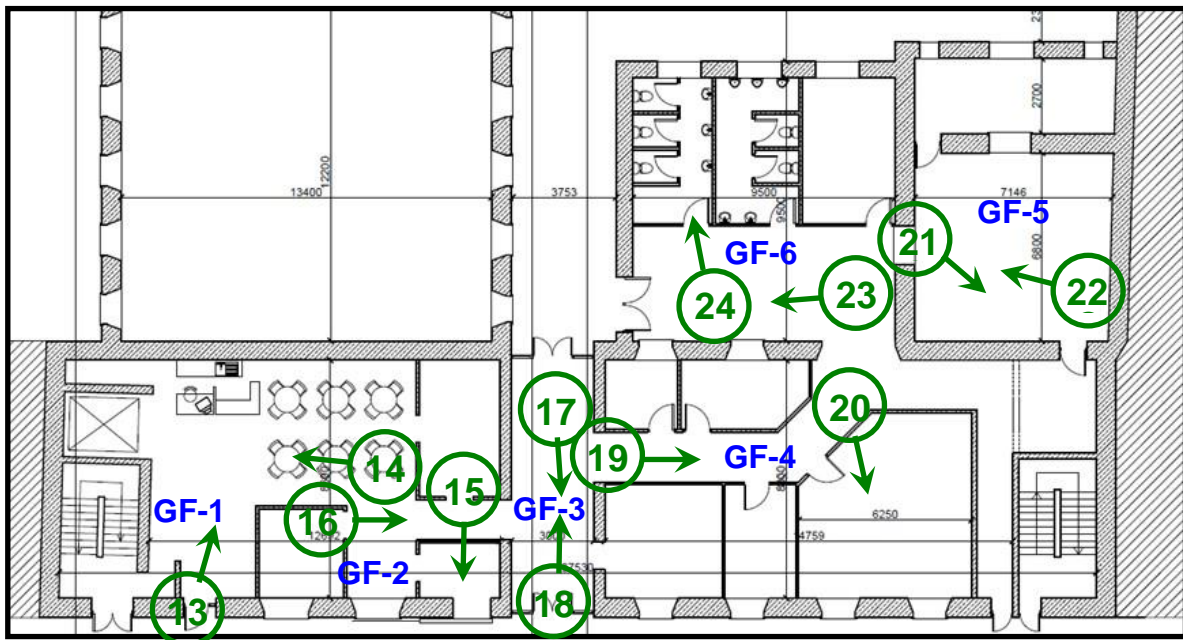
Ground floor plan of front building with room numbers and photograph locations
